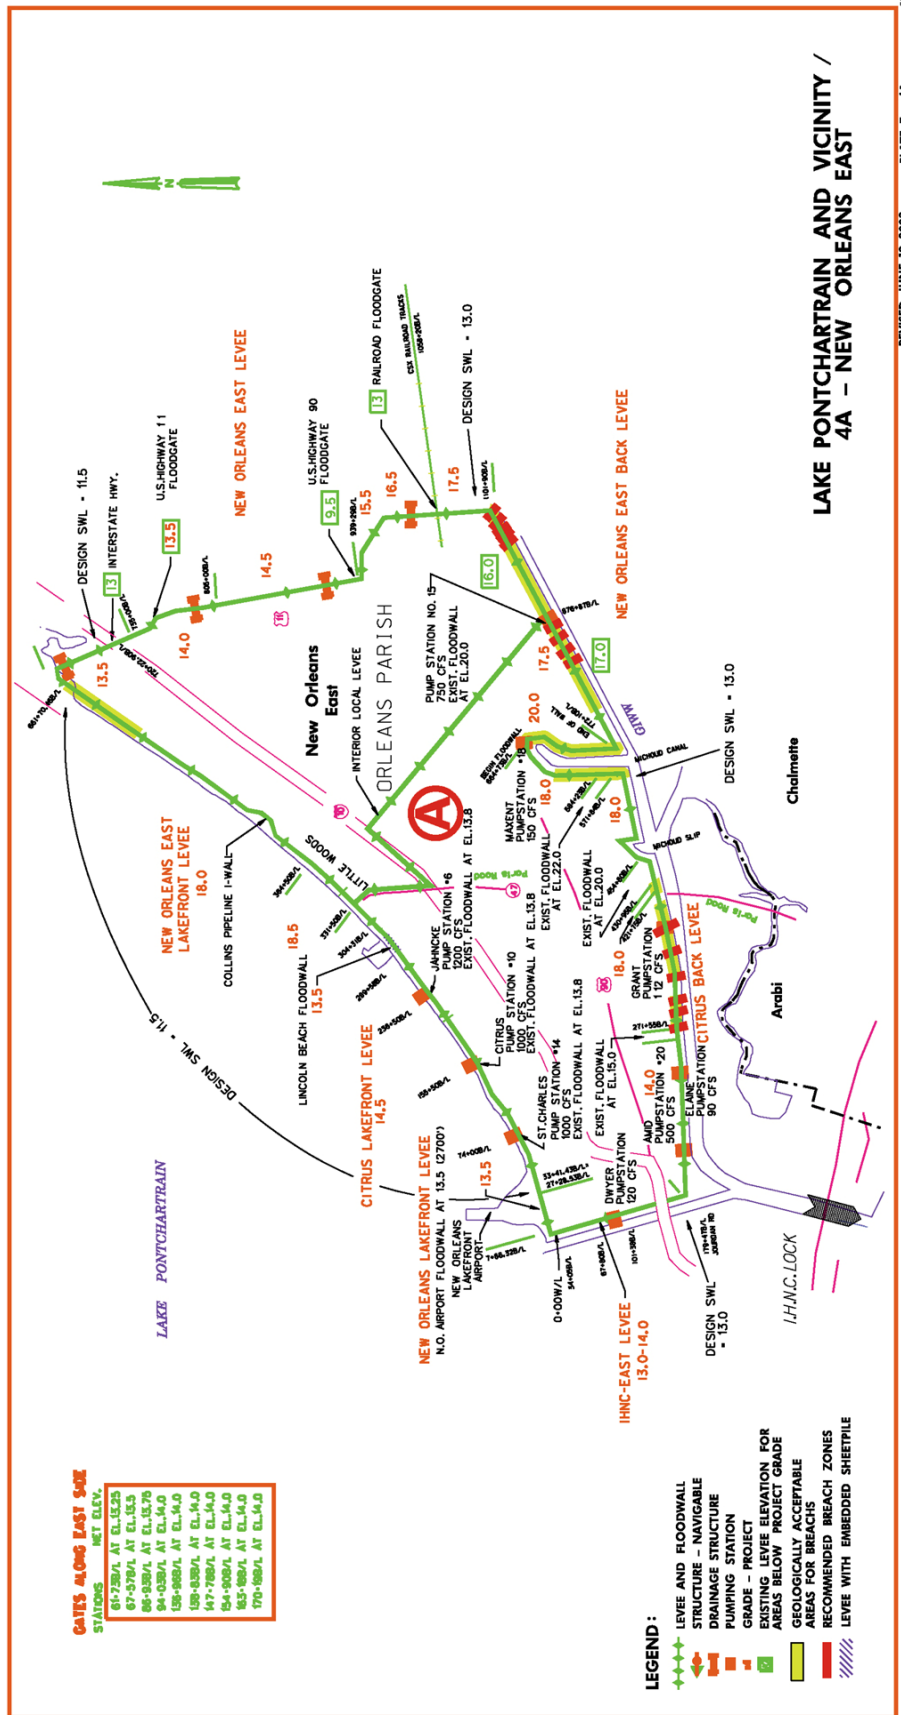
NOE basin general components and top of levee/floodwall as-built elevations (feet) (source New Orleans District (Wayne Naquin)).
